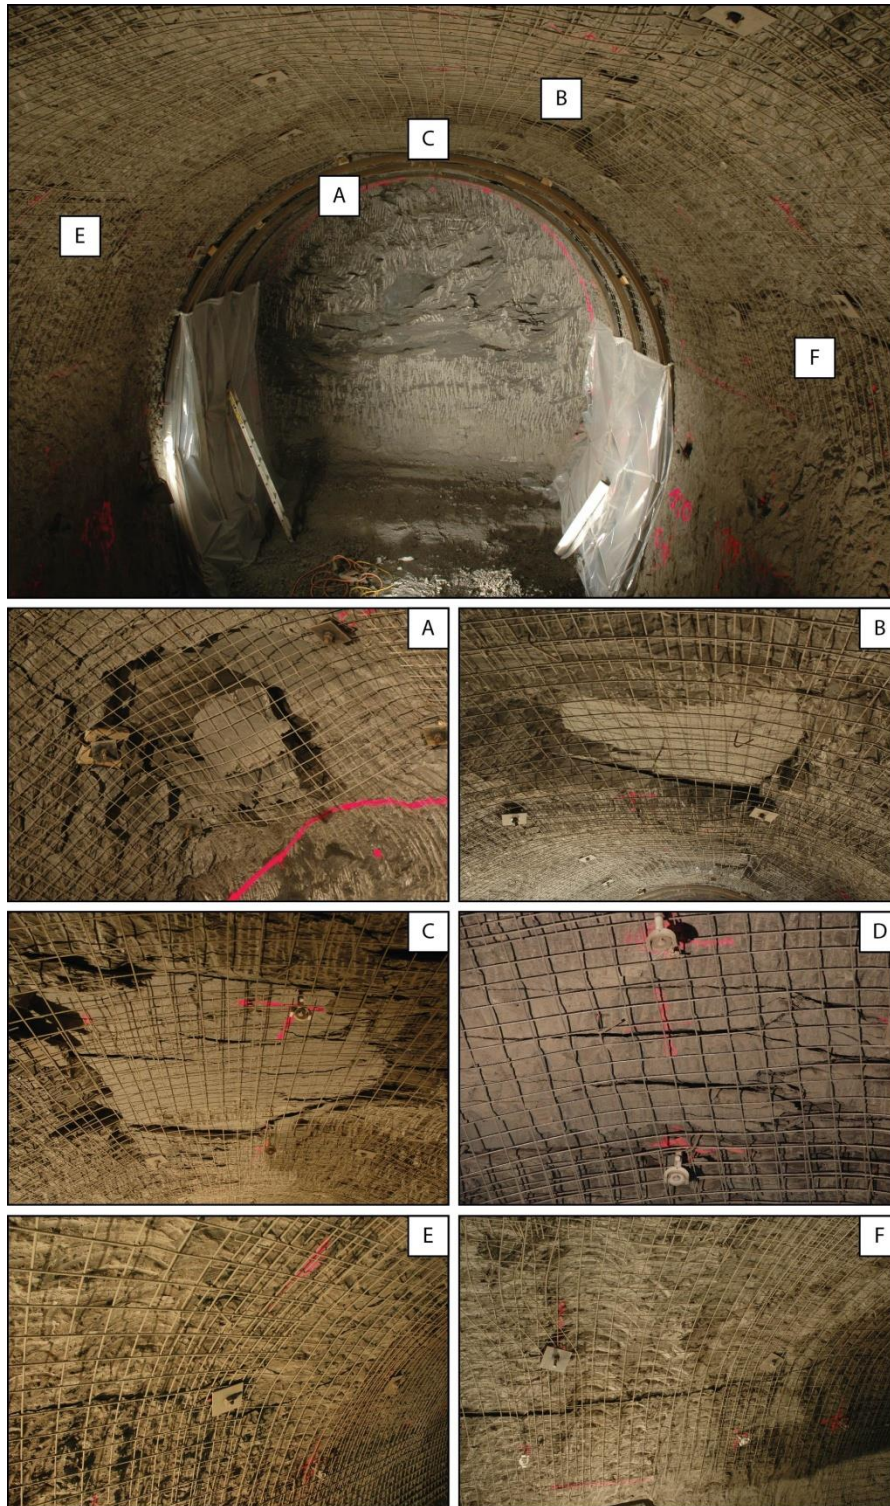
Observed failure mechanisms of the rock mass throughout the excavation of the mine-by section leading to minor and major tunnel instabilities. (A) Stress-induced breakout at the tunnel crown. (B) Slab at the crown (GM 106 - 108) that progressively detached along a SW-dipping fault plane leading to settlements up to 45 mm. (C) Structural-controlled crown instability between GM 109 - 112. (D) Locally disintegrated rock mass at GM 118.5. Upper discrete boundary of the sidewall spalls on the (E) NE-sidewall and (F) on the SW-sidewall between GM 102 - 109. The upper sidewall prisms located on the spalls indicating horizontal displacements up to 40 mm.
